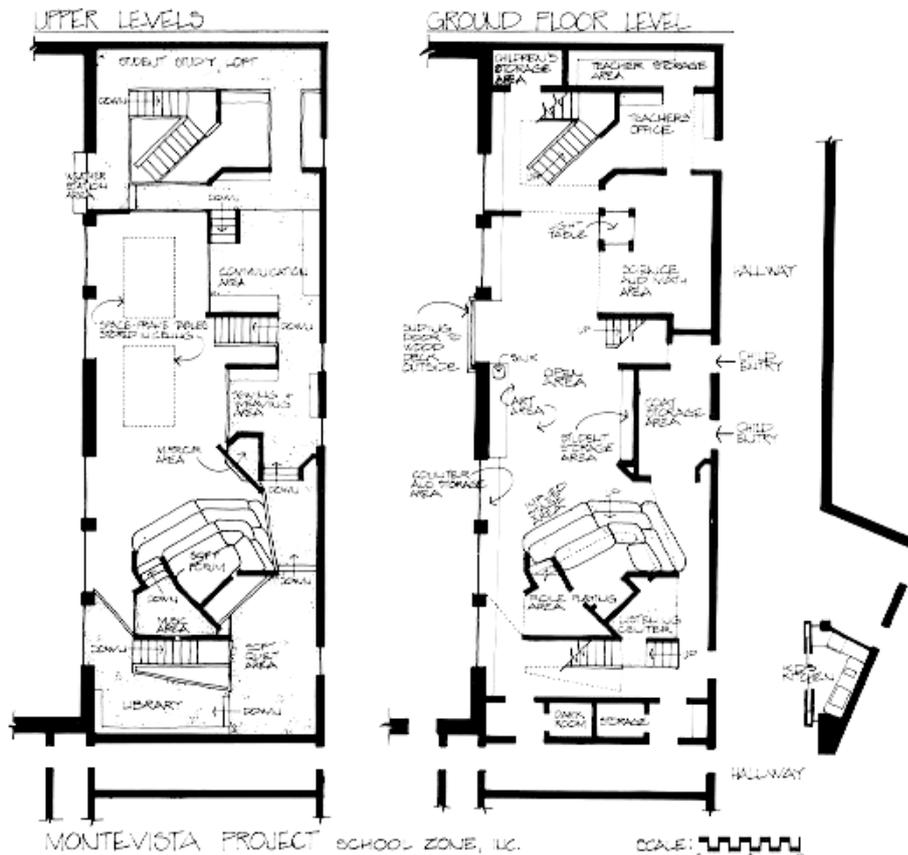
Monte Vista Elementary School plan view. Note levels and zones for diverse activities, space frame table on ceiling using block and tackle pulley system (physics), and both student and teacher workspaces and storage. (Source: George Vlastos 1976)
